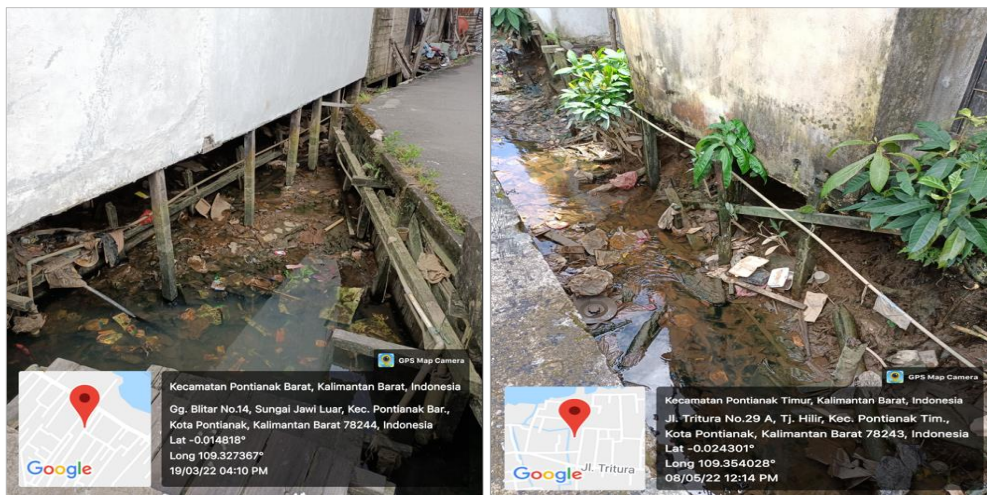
House building at low elevation close to the trench (normal conditions without tidal flood).
